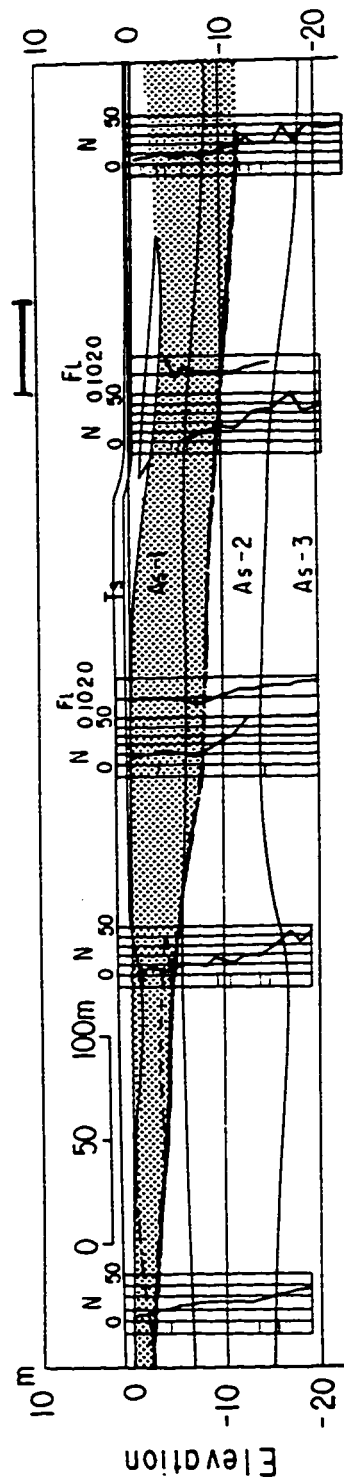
Geotechnical setting at the NHK Building site (adapted from Hamada, 1992)
